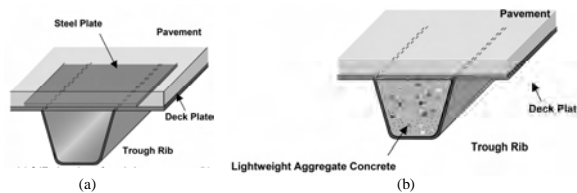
Retrofit approaches by Machida et al. (2004), (a) steel plate reinforcement, (b) concrete filled ribs.
